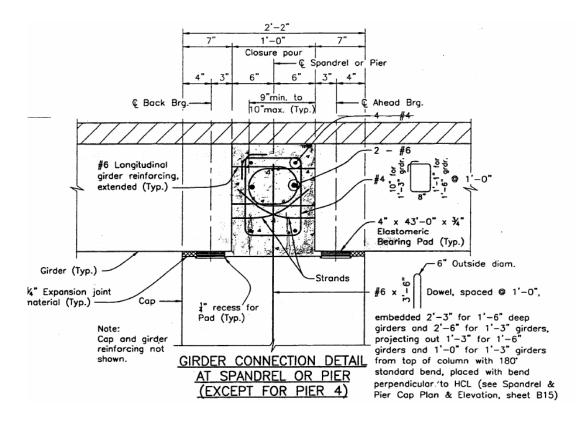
Continuity detail over the cross piers used on Castlewood Canyon Bridge, Colorado
